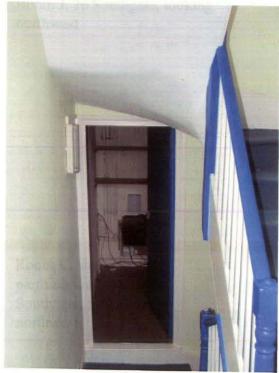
Room G mezzanine store room, 26 Southgate, looking north
